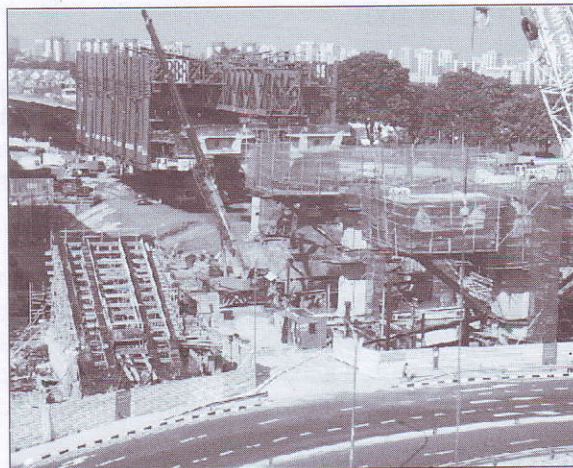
The use 'Span by Span Cast Insitu Suspended Formwork Method'
